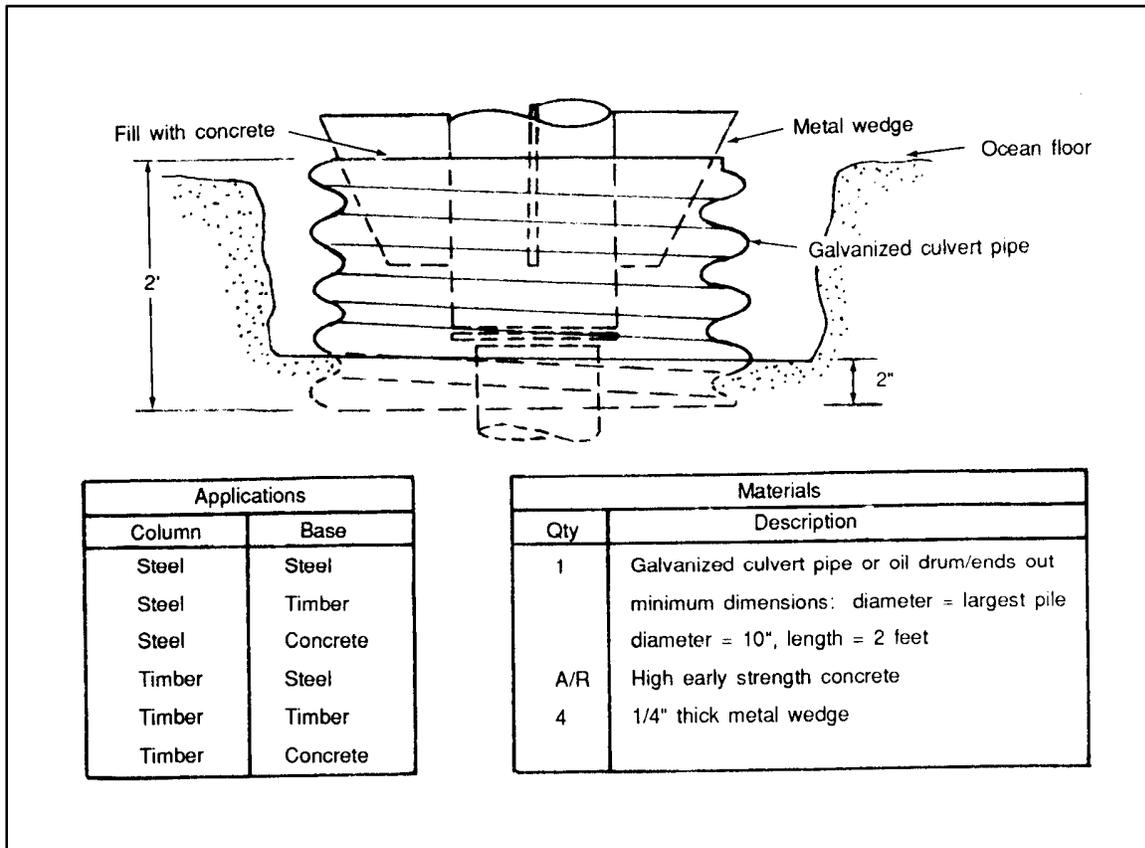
Joining piles at the ocean floor with concrete, column to base connections (connecting method 6)
